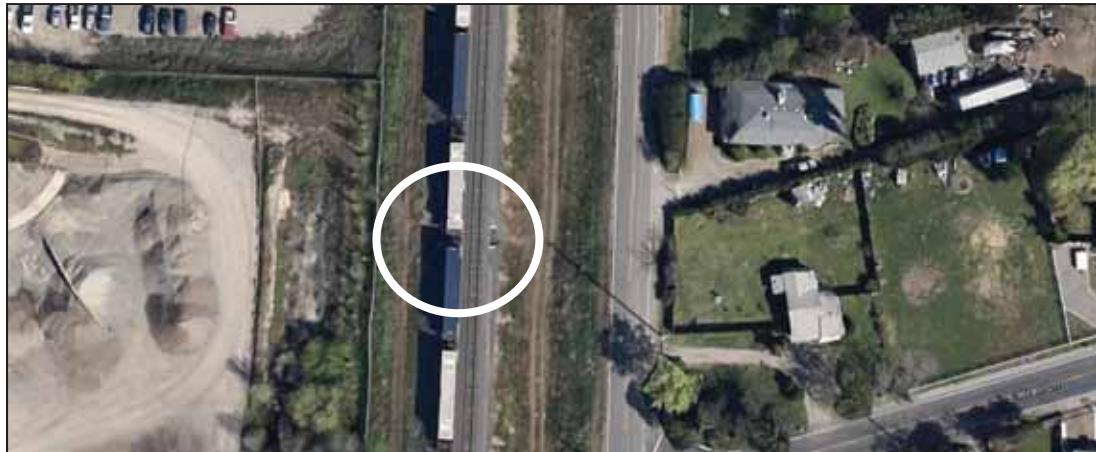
Aerial photo of the added culvert near E. Krell Lane
